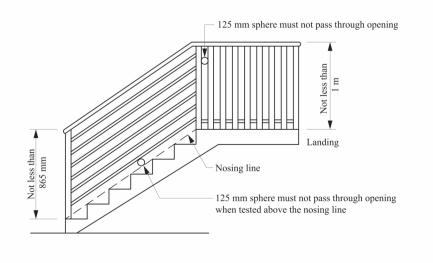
Measuring heights for barriers and handrails and where transition zones are allowed
